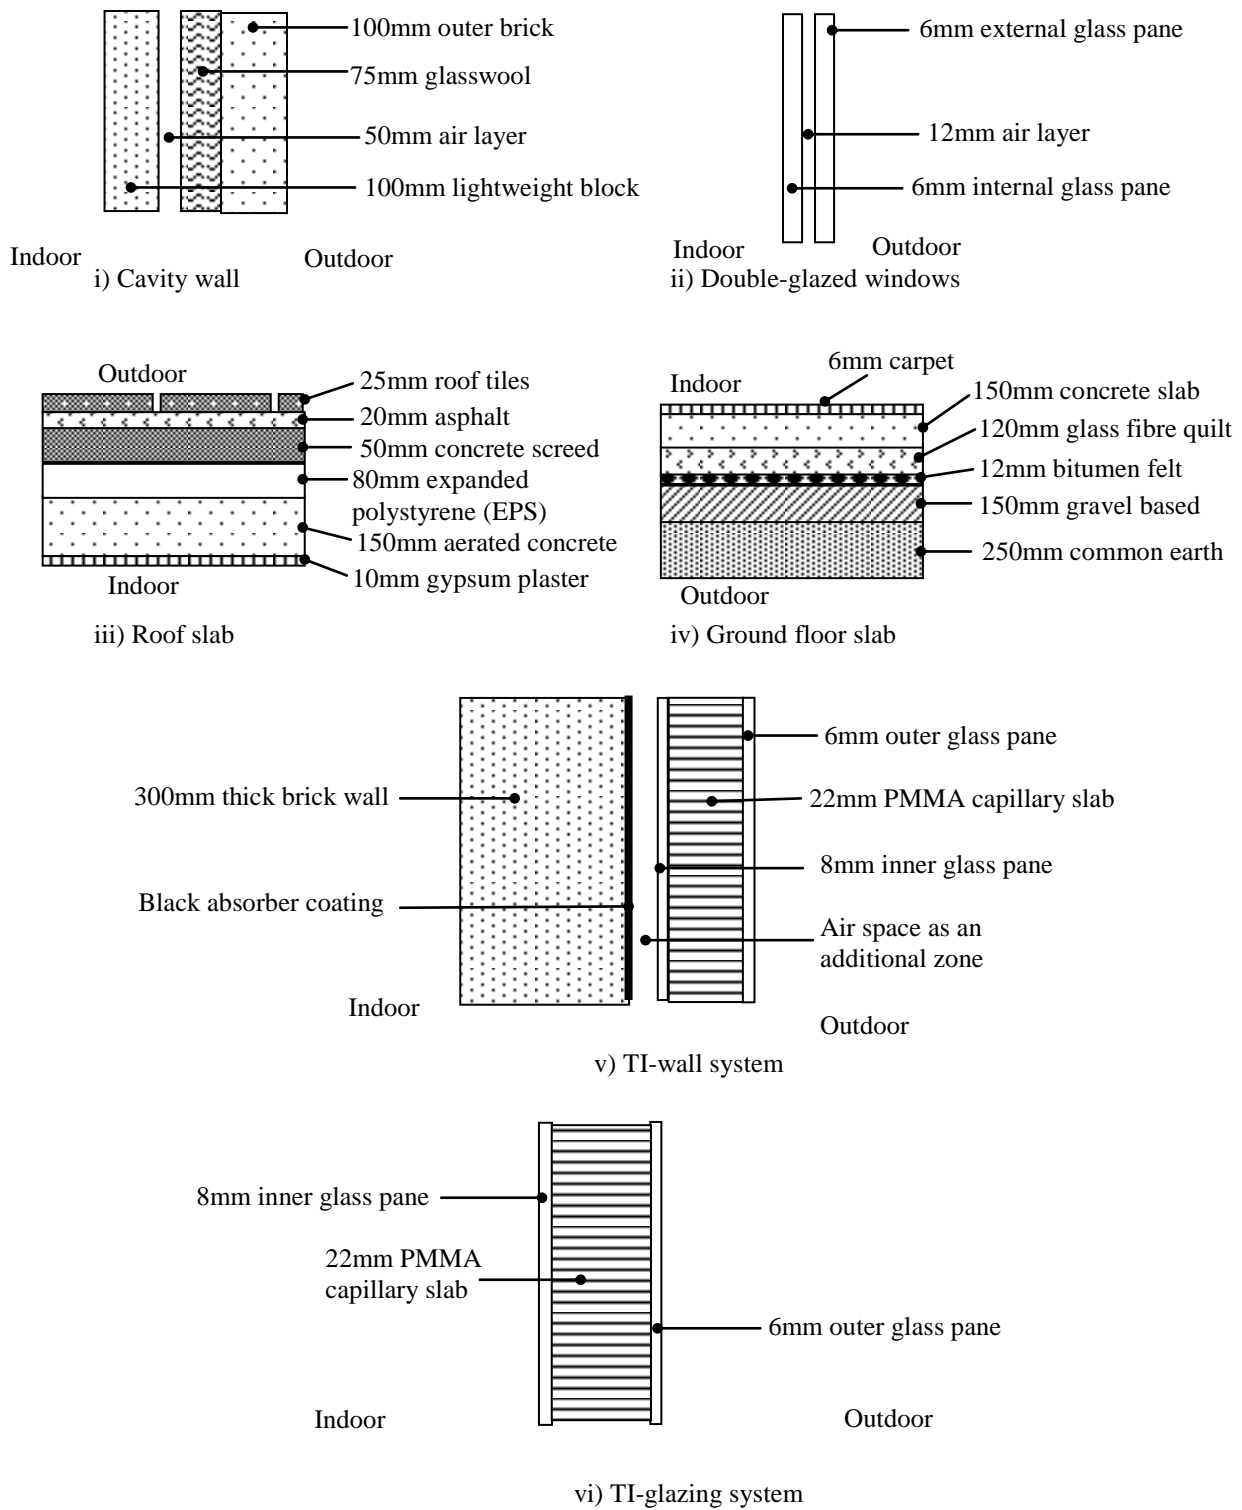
Construction of conventional building envelope and the TI-facades used in office buildings
